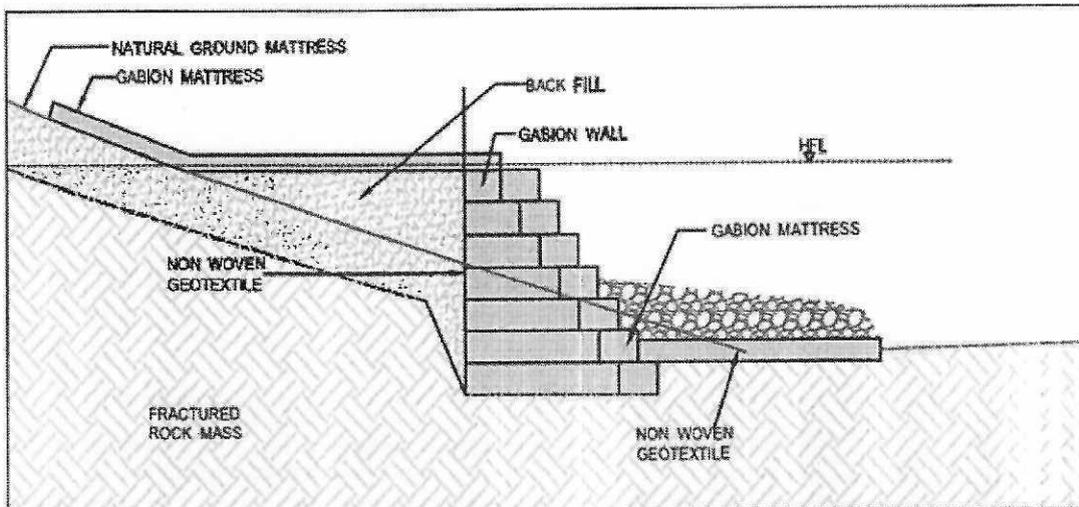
Cross-section of Gabion Retaining Wall with Launching Apron on River Bed
